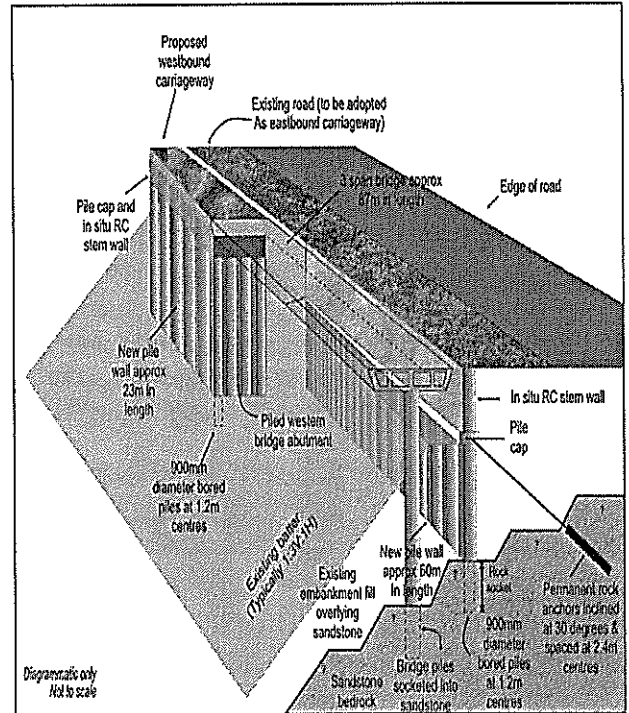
Combined Bridging Structure & Bored Pile Walls (Anchored & Cantilever) – Fill 2
